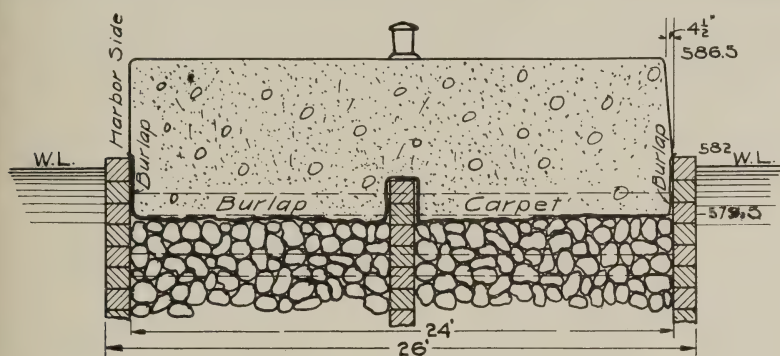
Proposed cross section for concrete superstructure of the main breakwater, showing how the concrete might have been placed had footing blocks been dispensed with.
